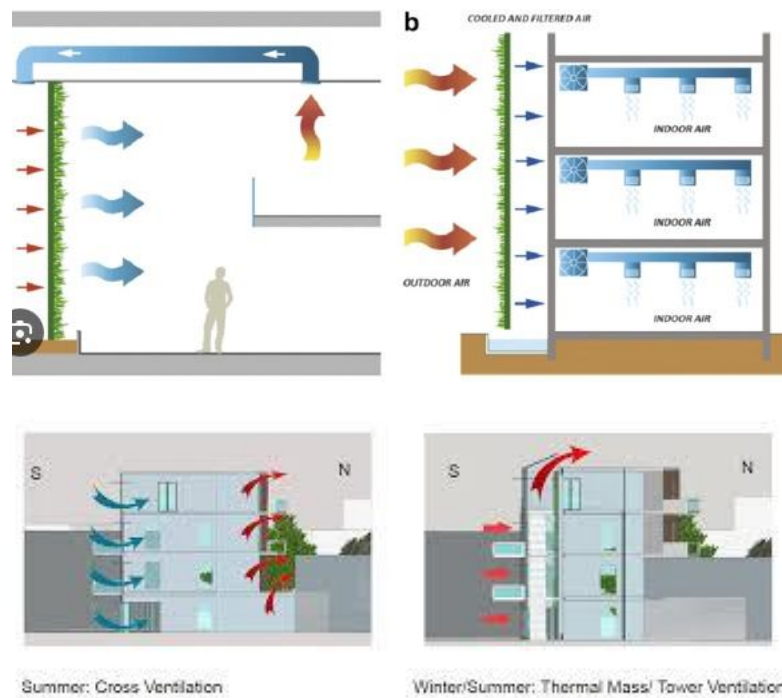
Space between the green facade and the wall of the building (Perez et al., 2011)
